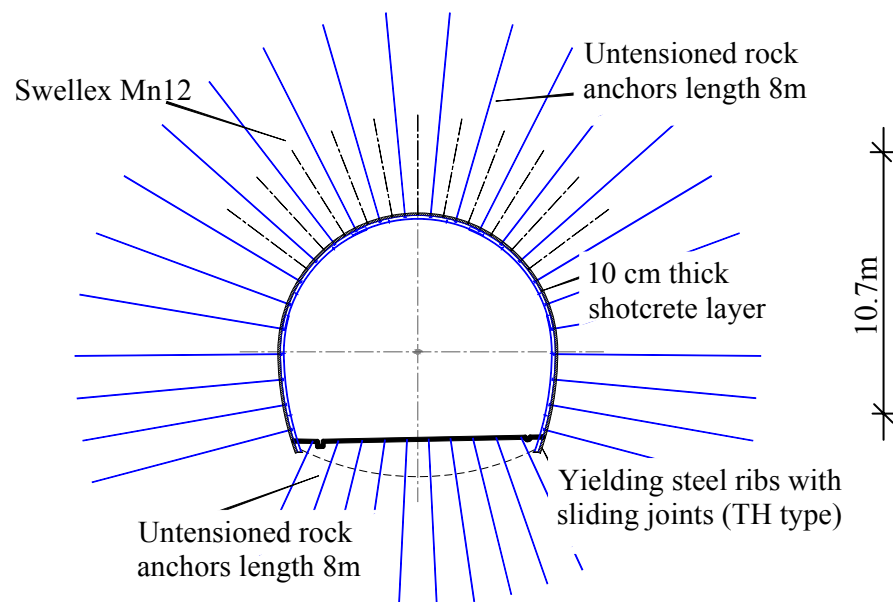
Tunnel cross section showing the excavation-support system P7.3 adopted between chainage 1267 and 1324 m. For sake of simplicity the face pre-reinforcement is not shown.
